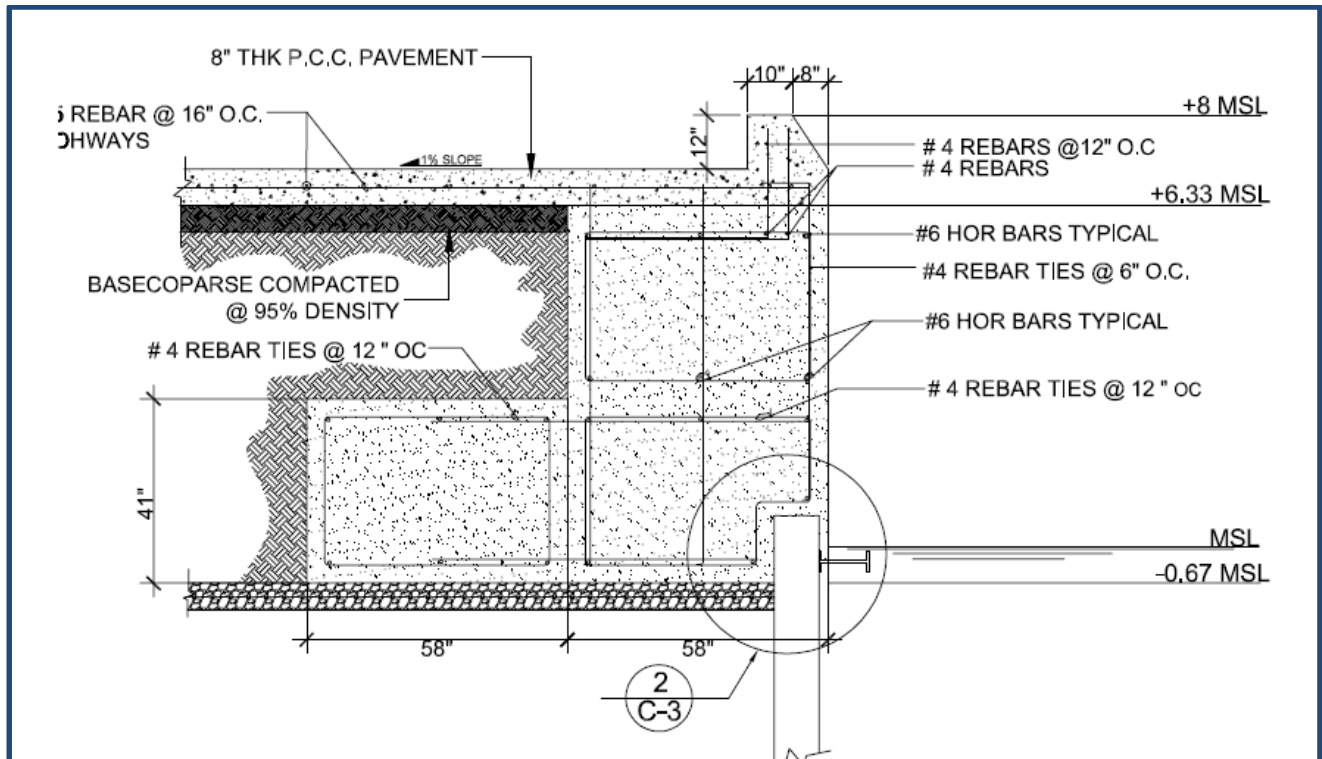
Typical Section - Connecting Pier, North West Portion
